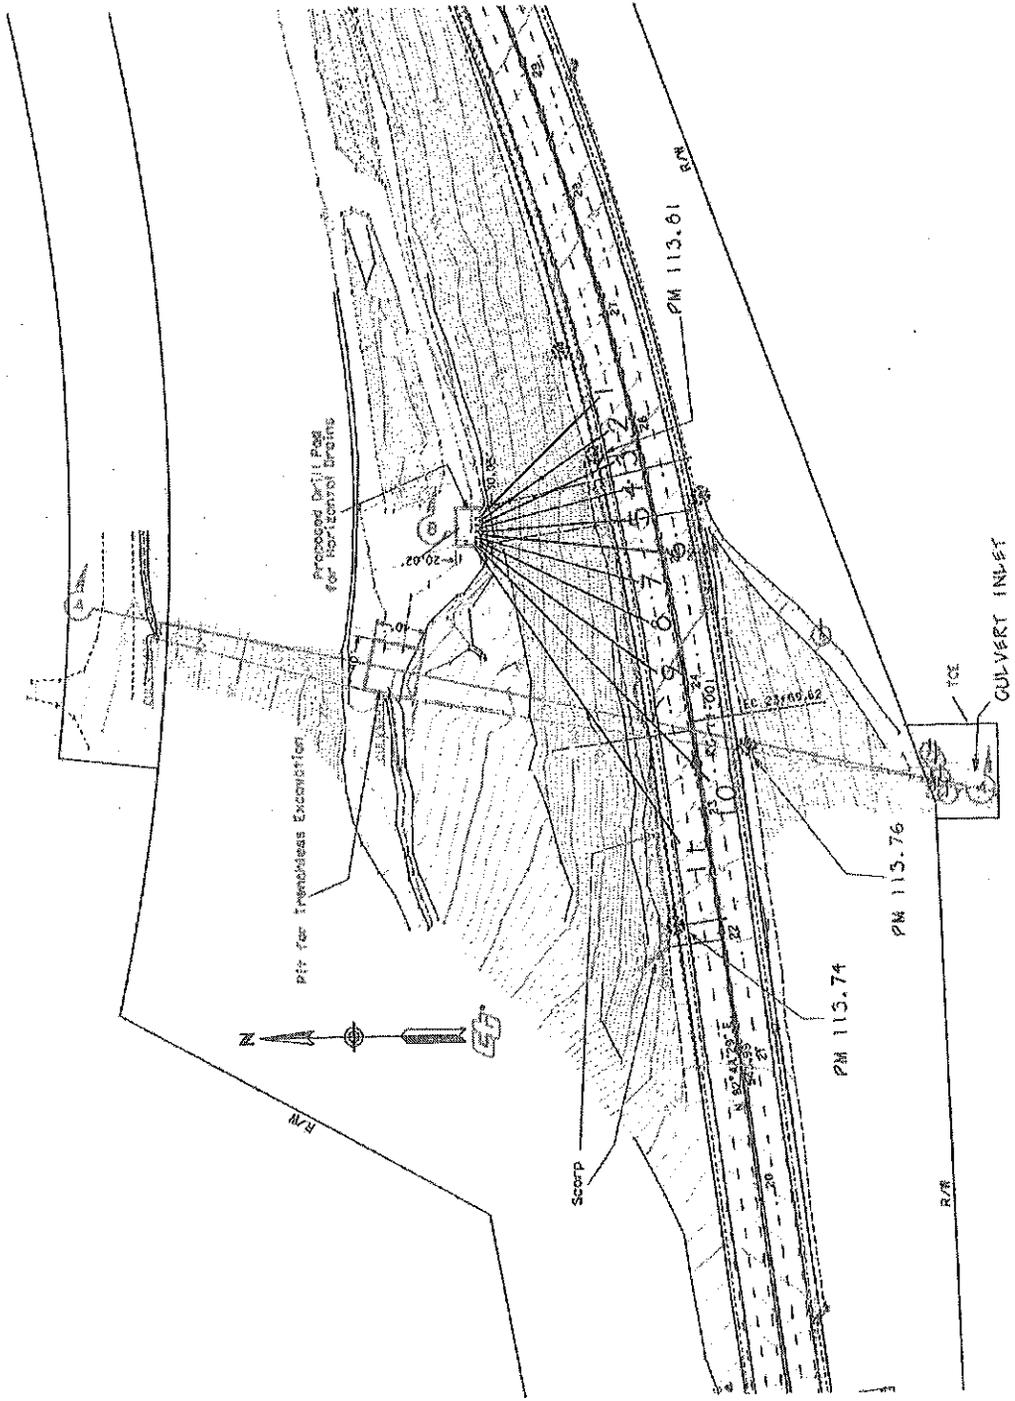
Plan map of U.S. Route 101 at PM 113.76, EA 01-0B420, showing horizontal drains and location of the new culvert.
